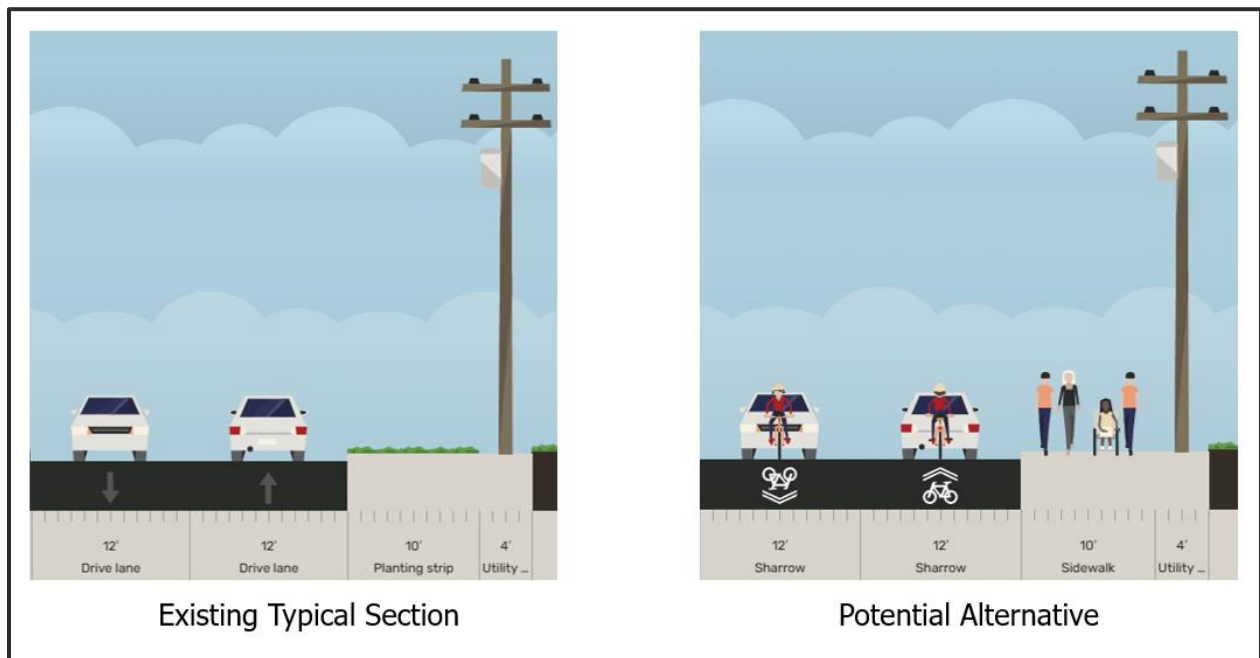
E Canal Street Existing and Potential Alternative Typical Section
